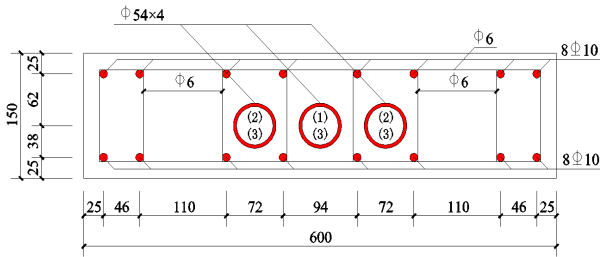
Installed positions of the segment cross sections of the steel bars and ASCFSP components
